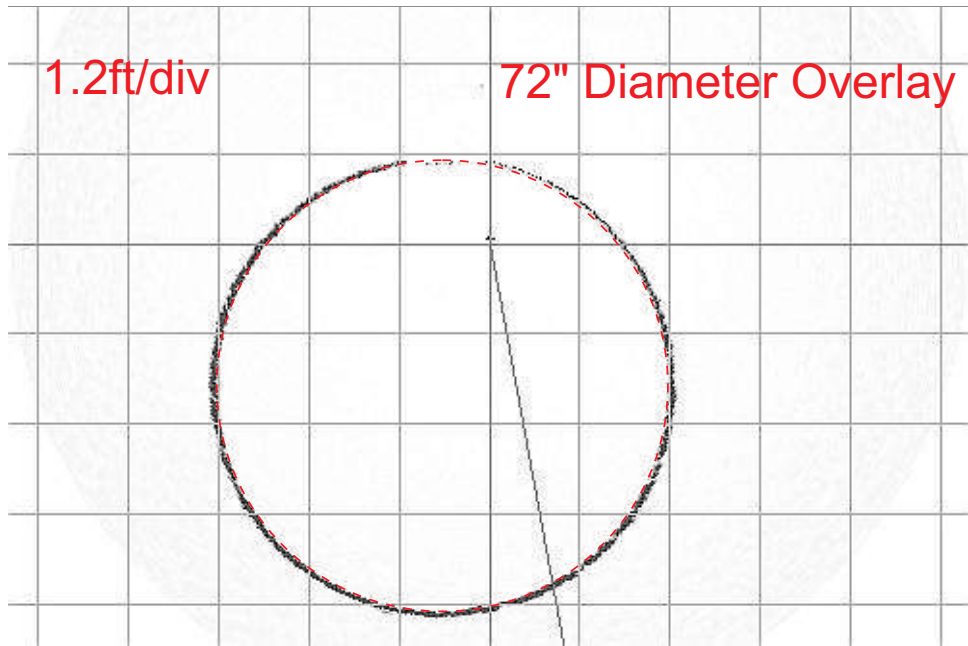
Sonar Profile 13 - 187 feet downstream of Access Point 1.
